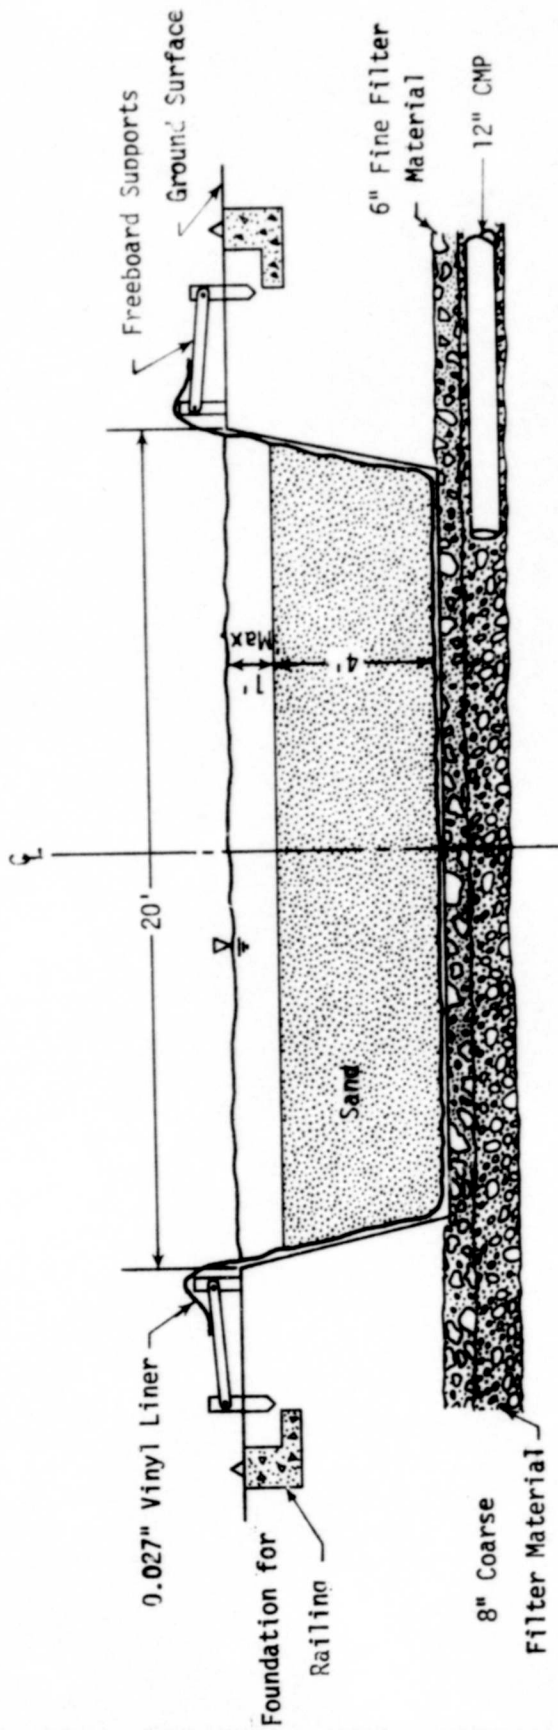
Cross Section of Modified Test Pit, Bunker 804, Site 300
